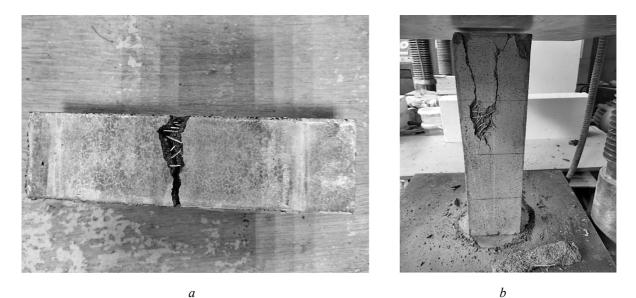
Prism specimens of steel fiber concrete, after testing: a – tensile strength in bending; b – prism strength
